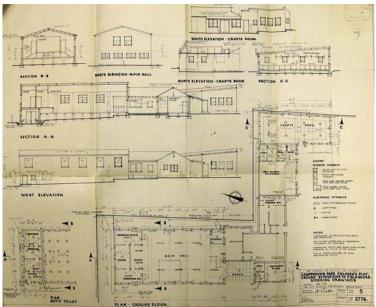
The Field House scheme in 1960 which proposed the additions of extra play rooms, stores and amenity facilities. It would appear that the existing building was constructed from this proposal. Source: City of Sydney Archives, 4500/56.
